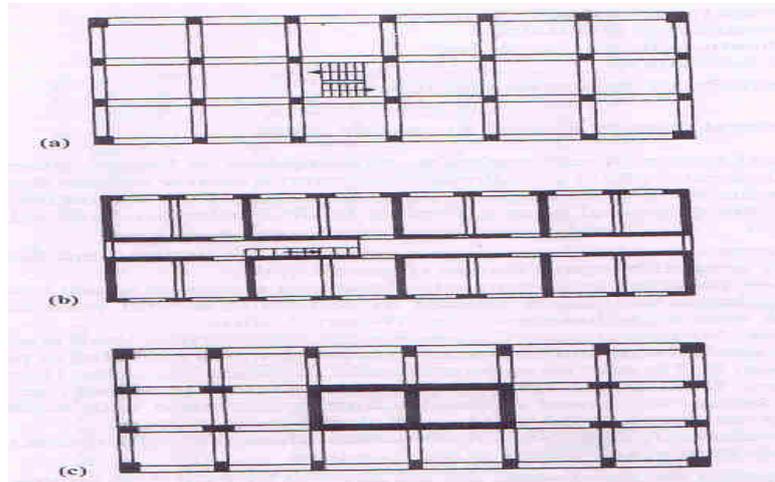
Common Lateral Load resisting Structural Systems (a) Frame (b) Shear wall (c) Dual (core & frames)
